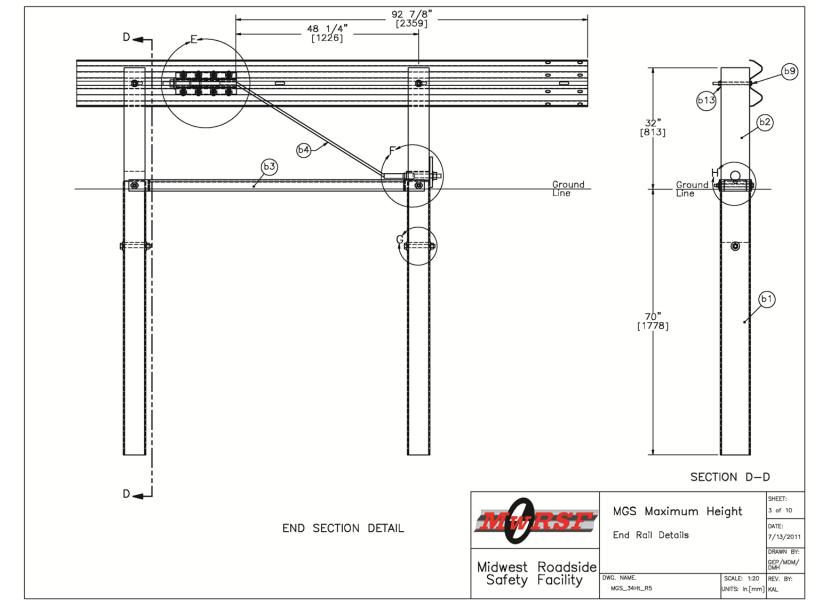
BCT End Anchor Details, Test No. MGSMRH-1
